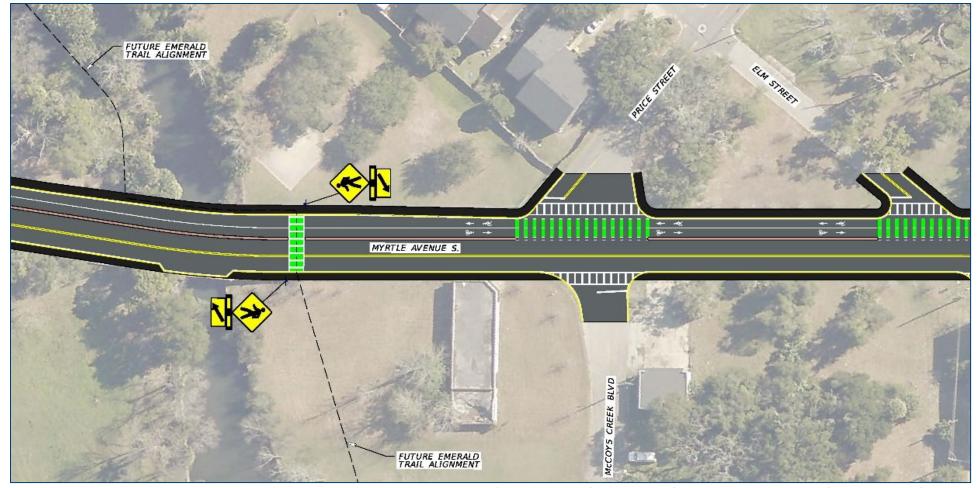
Detail of Roll Plot (Segment 1, Emerald Trail to Elm Street)
